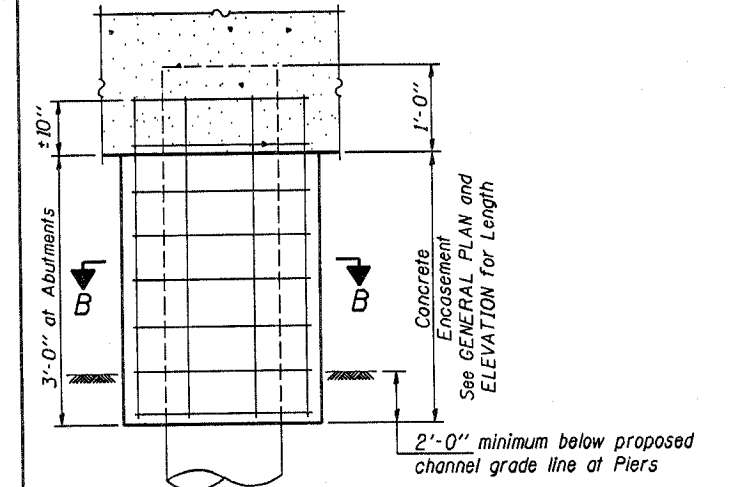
DETAIL OF REINFORCEMENT FOR METAL SHELLS
